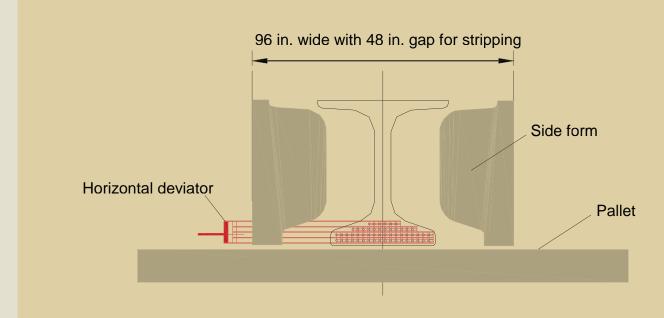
The cross section with movable side forms had a design requirement of at least a 96 in. width in order to remove the falsework. Note: 1 in. = 25.4 mm.
